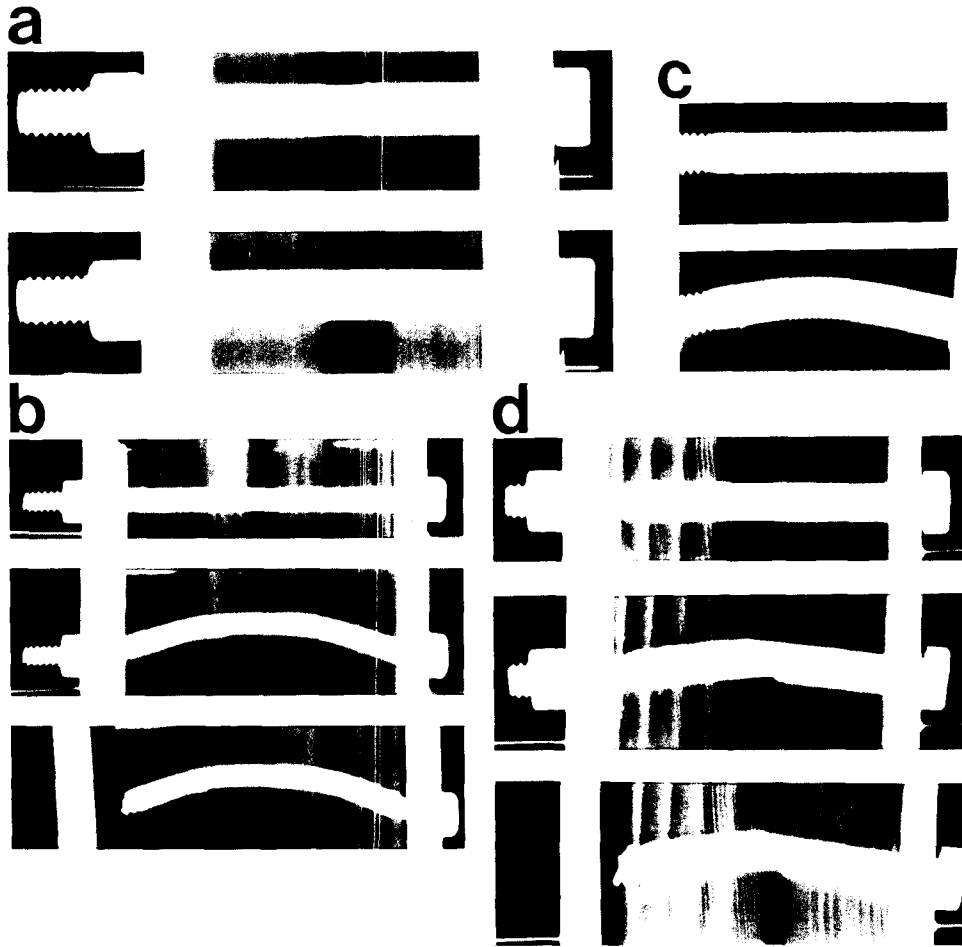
Representative X-ray plates for supplemental joints manufactured with steel side members of varying thicknesses and bolts of varying diameters: a) thickness = 12.8 mm, diameter = 12.5 mm; b) thickness = 6.4 mm, diameter = 6.4 mm; c) thickness = 2.0 mm, diameter = 12.5 mm; and d) thickness = 6.4 mm, diameter = 9.5 mm.
